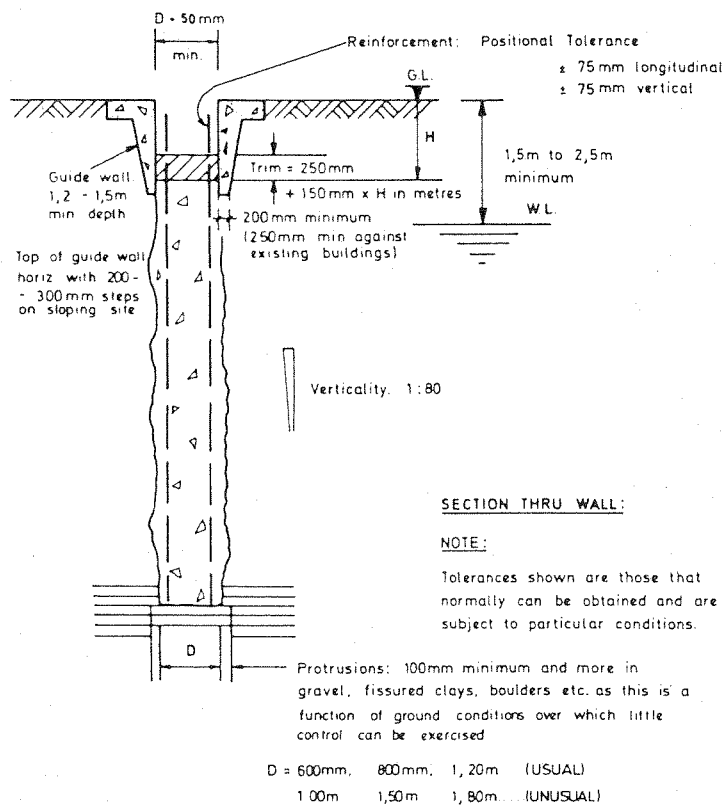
SECTION THROUGH DIAPHRAGM WALL
